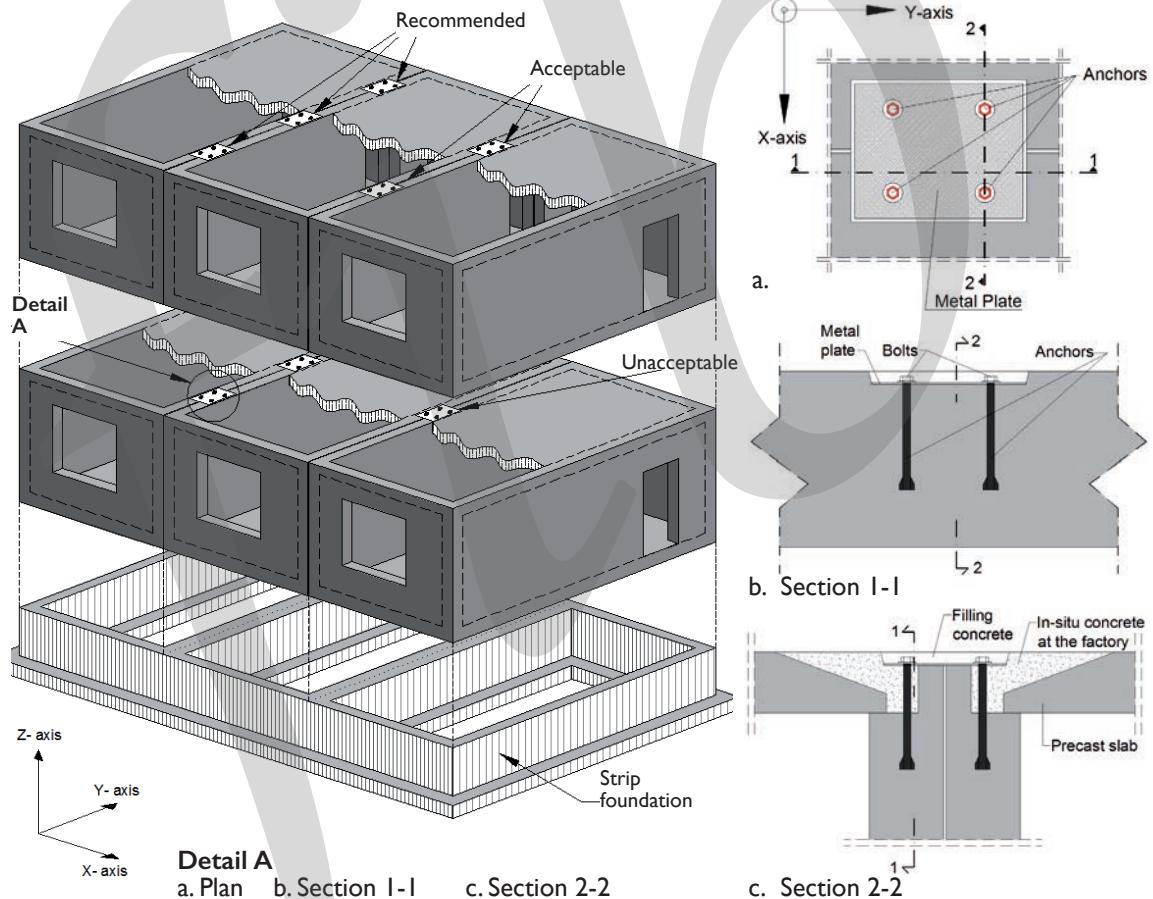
Horizontal connection between closed cell units using dry connections at top of slabs (other reinforcements not shown for clarity) (Manolatos et al., 2003)
